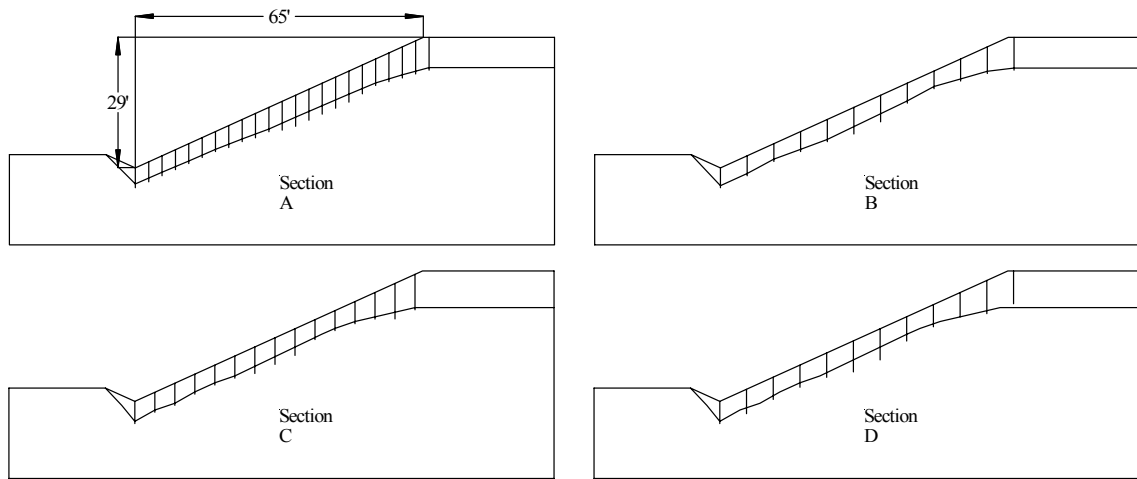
As-built cross sections for US36-Stewartsville site.
